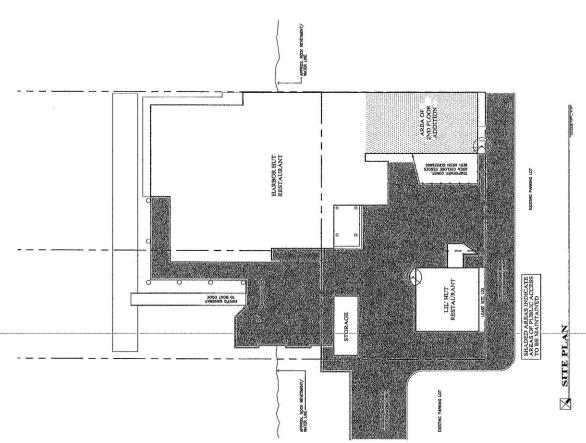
Exhibit D Application No. 3-12-044 Troy Leage Harbor Hut Office Addition Project Plans 4 of 4
